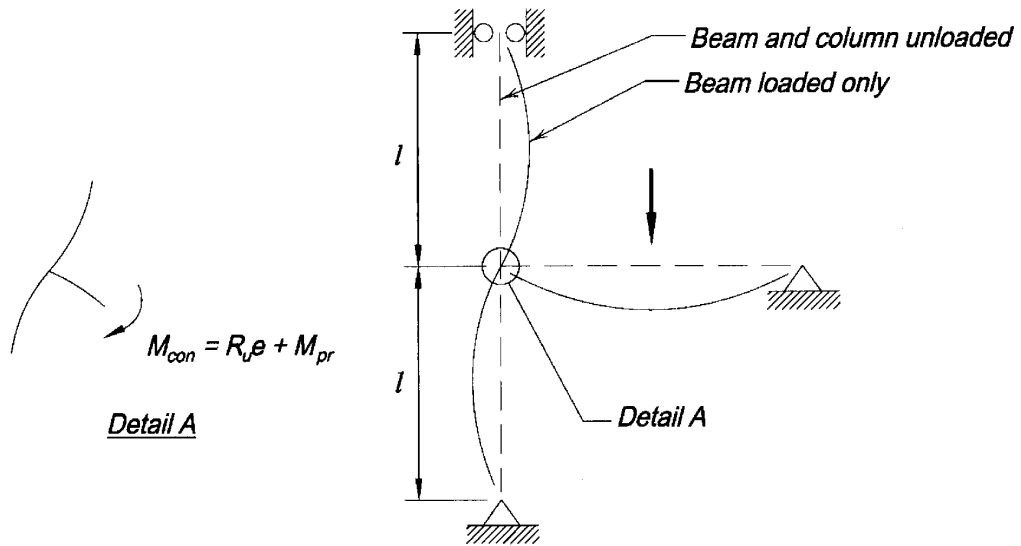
Illustration of beam, column, and connection behavior under loading of beam only.
